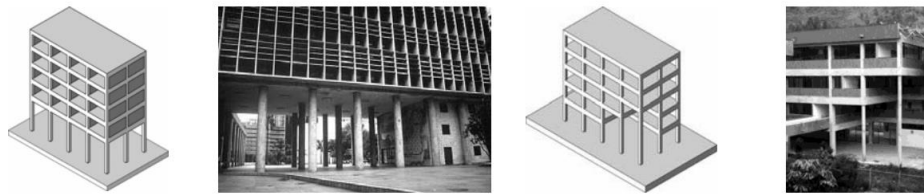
The form of a building with an open ground floor and a soft story.[5]
